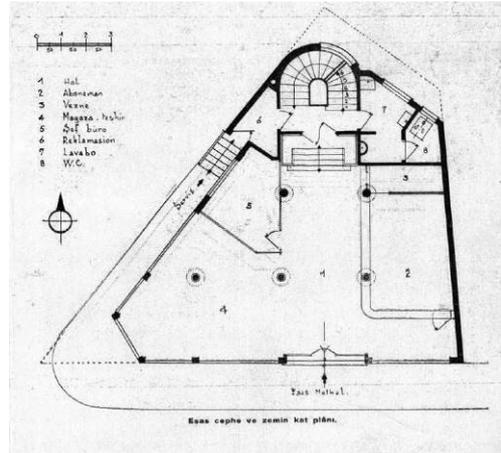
Façade and ground floor plan of Electric House by Rebiî Gorbon (1936).³⁰³
